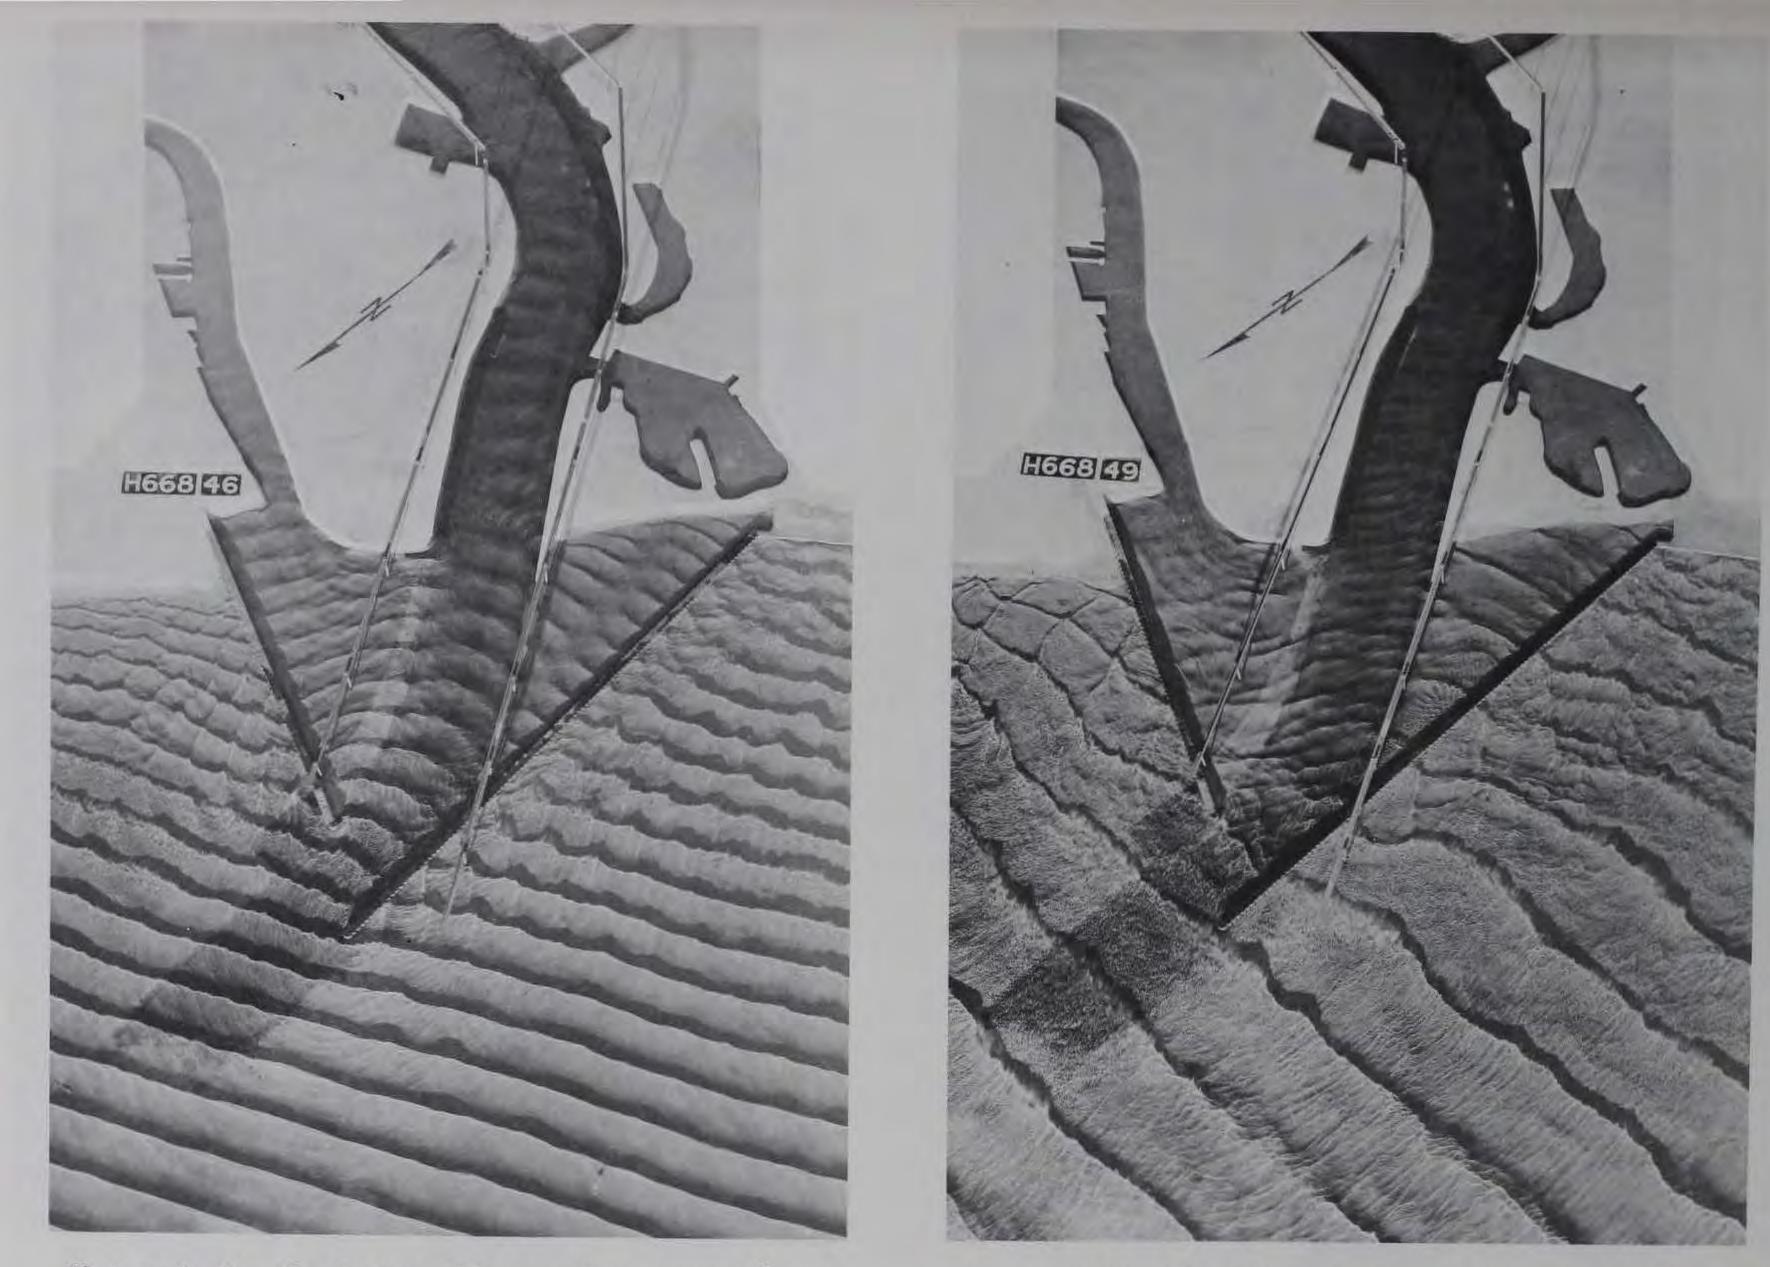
Plan 4; 5-sec, 7-ft waves from north 25° west
